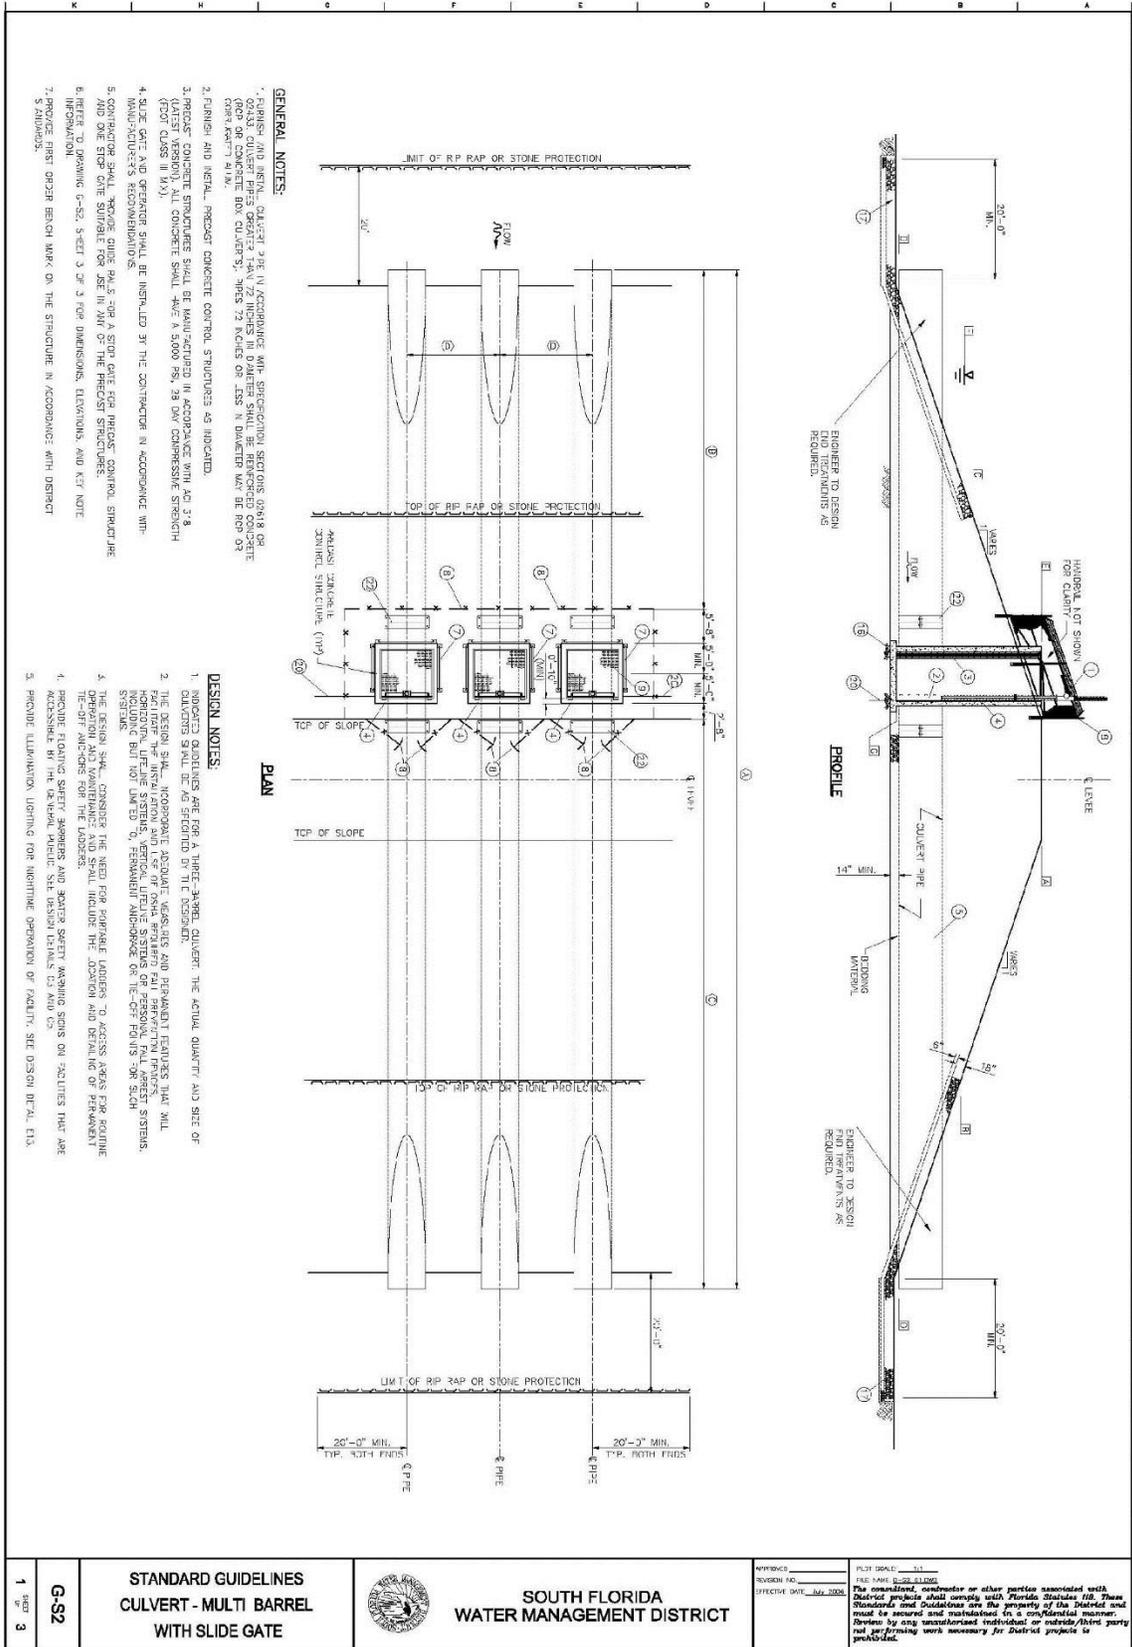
Standard Civil Details for a Multi-Barrel Box Culvert
